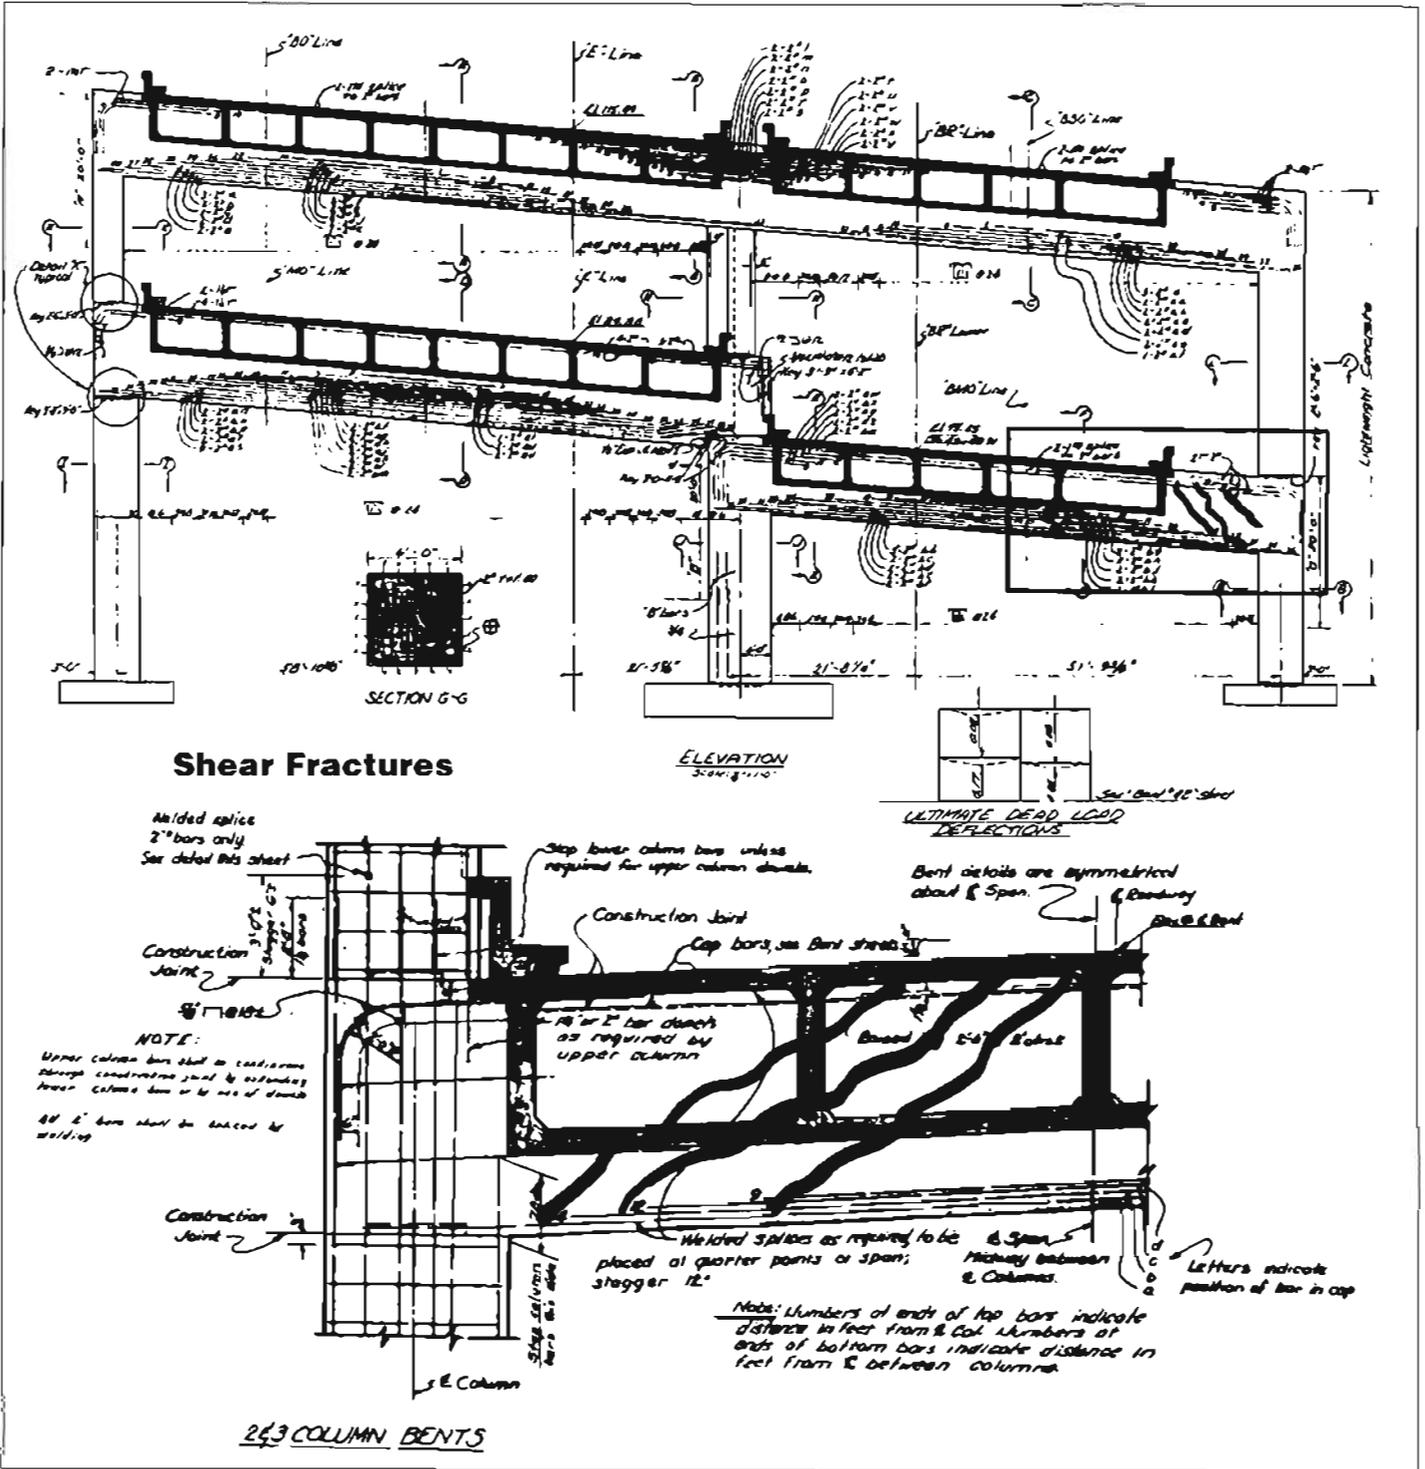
Earthquake damage to Terminal Separation Viaduct Bent 44; detail is from opposite side.
